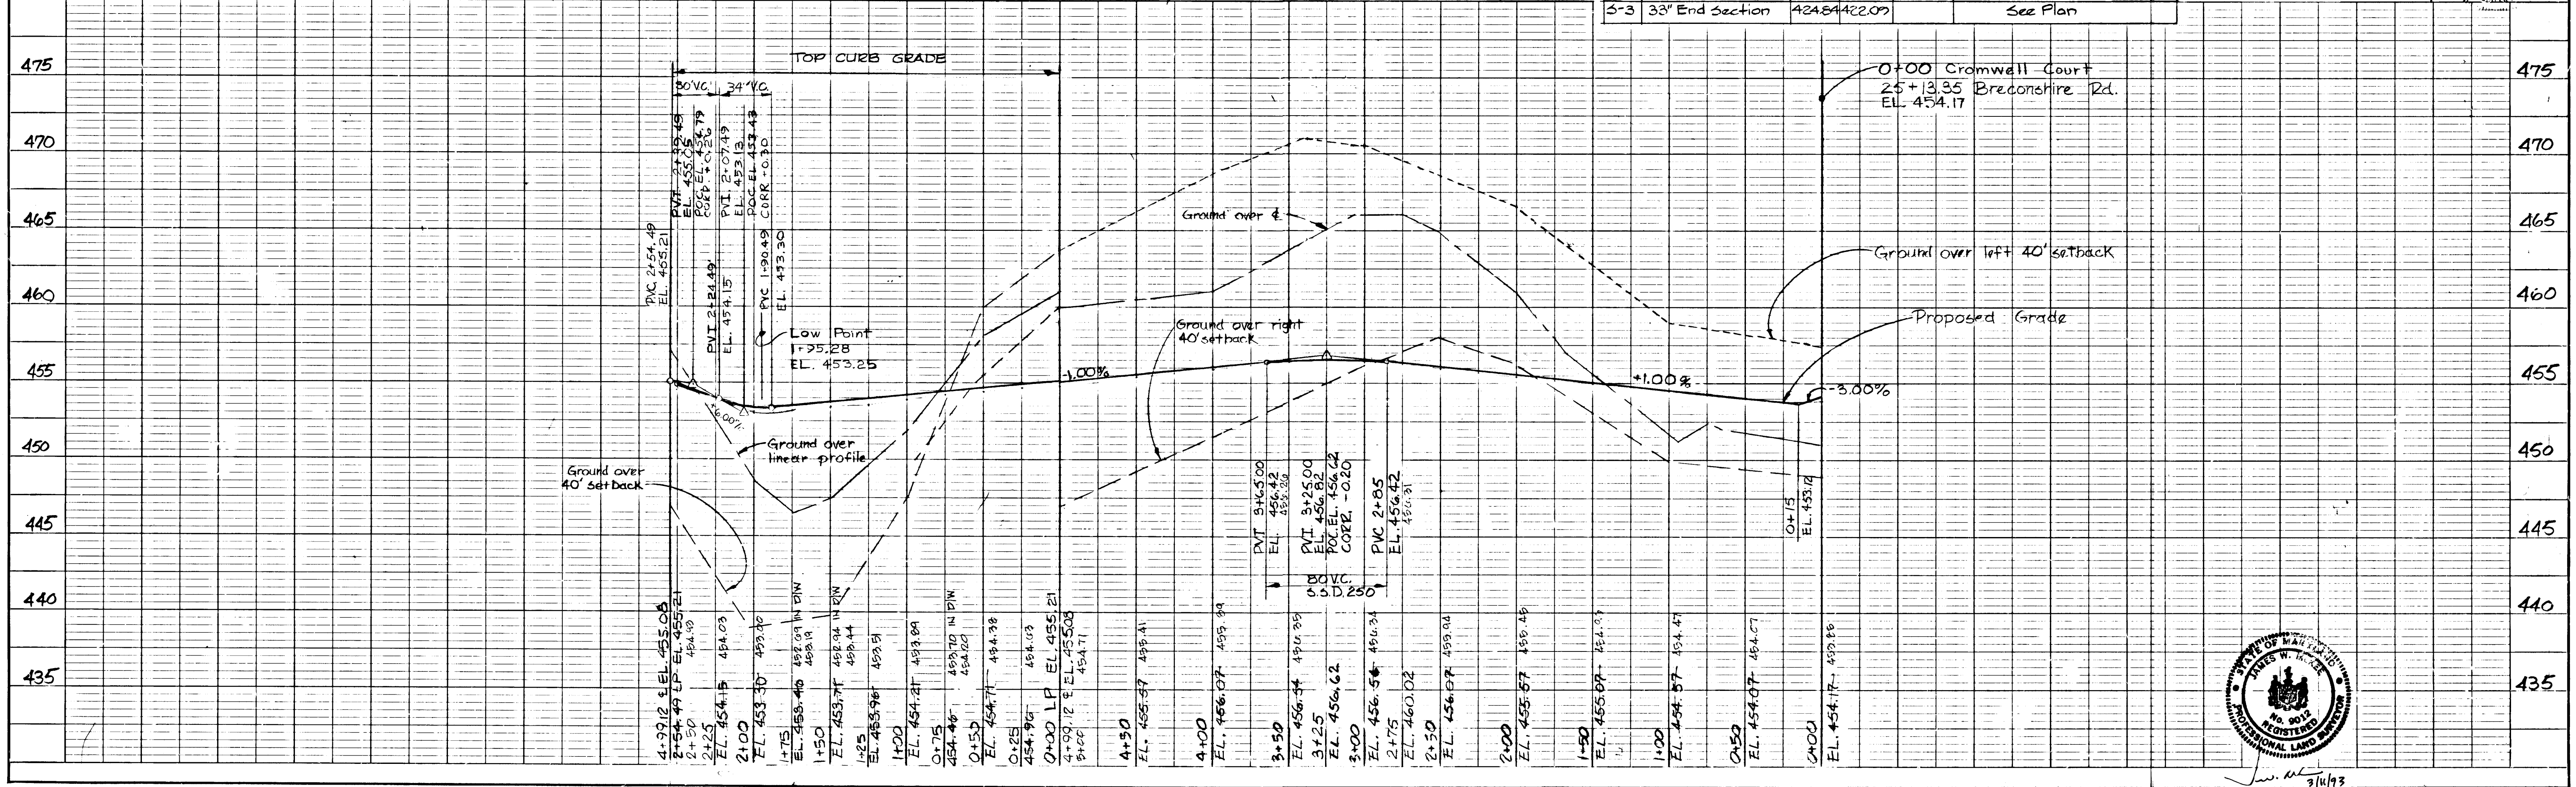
, PLAN PROFILE CROMWELL COURT - PROFILE
